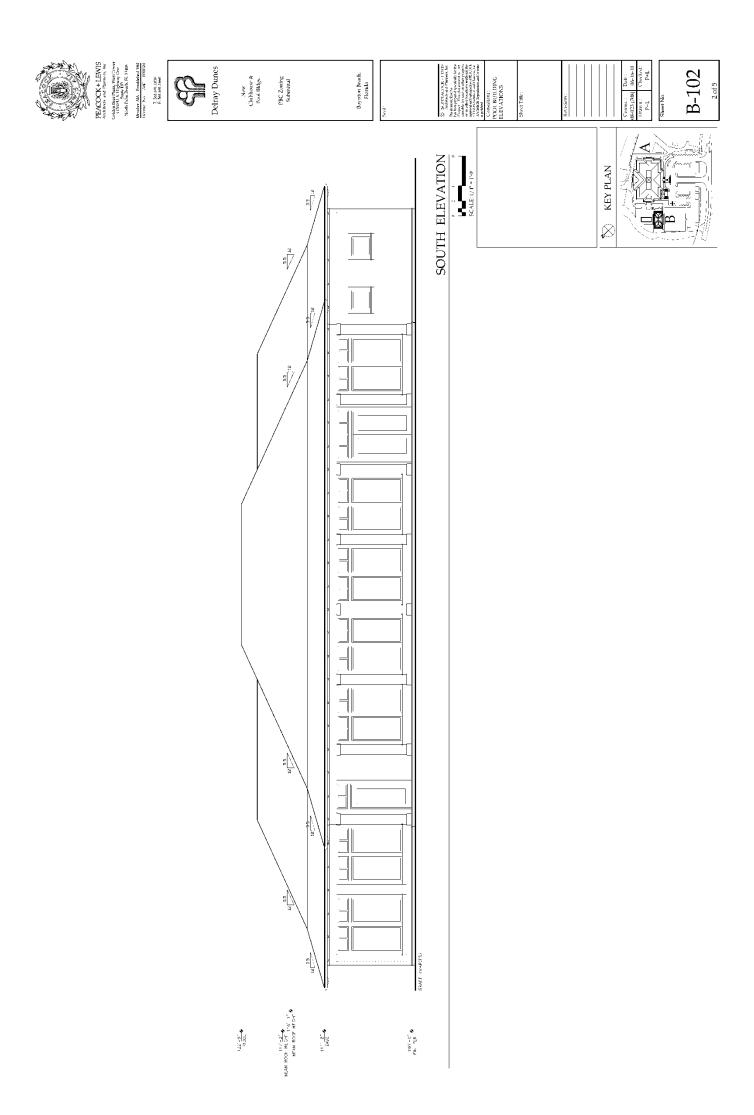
, Proposed Pool Building, South Elevation, dated June 16, 2010
